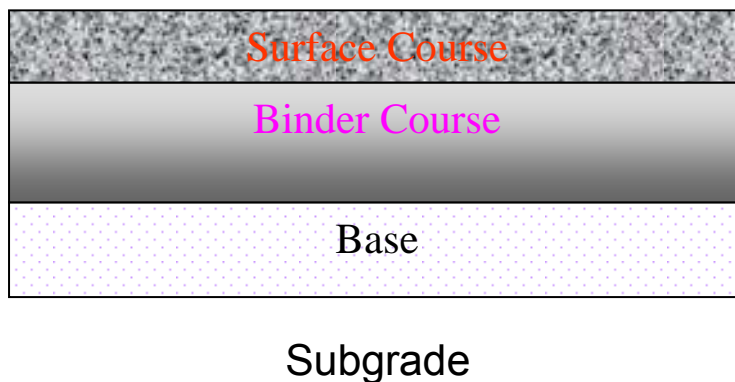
Typical Cross Section of a Conventional Flexible Pavement
